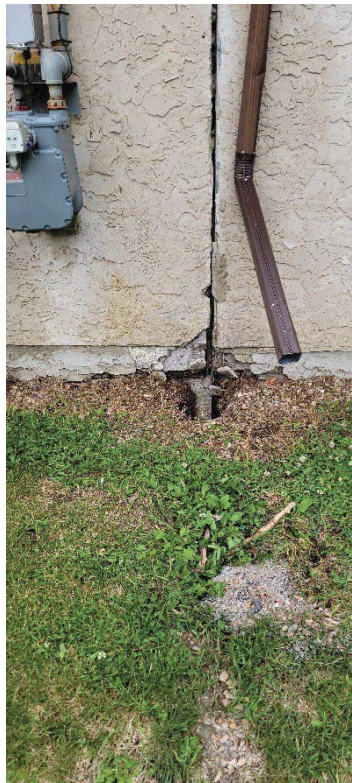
Deterioration at building joint, sinkhole into crawlspace
